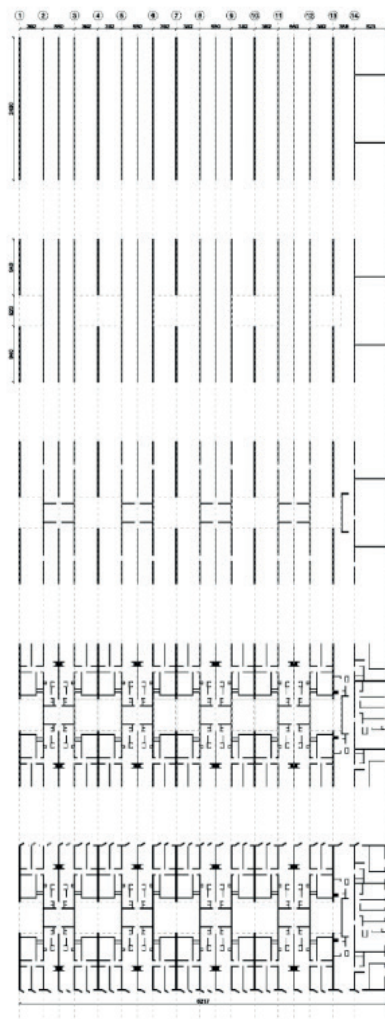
Plans as a process of wall densification (Drawings by the author based on the project documents)
